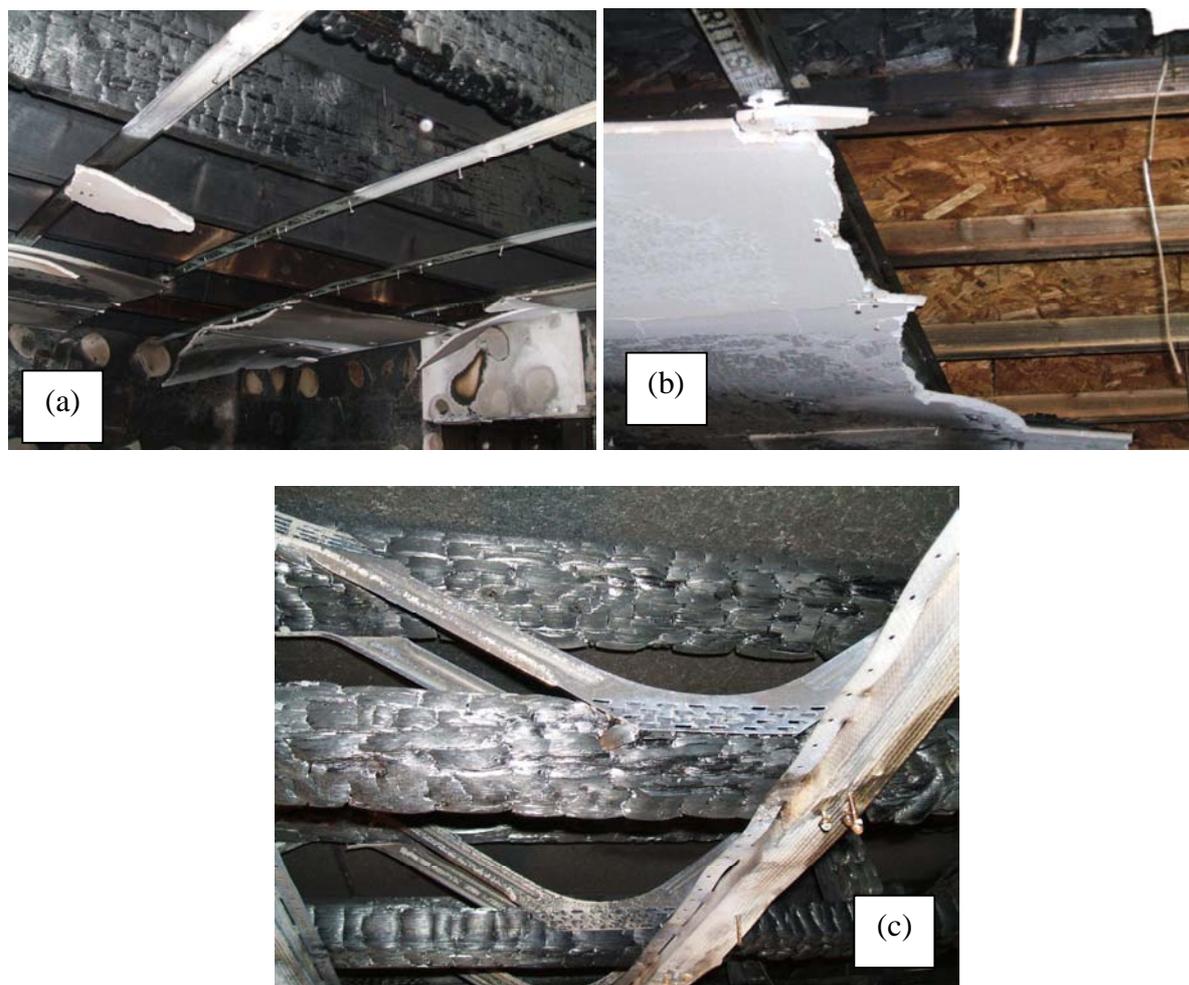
Systems after the fire tests (a) Solid joist (b) I-Joist (c) Steel truss web joist
